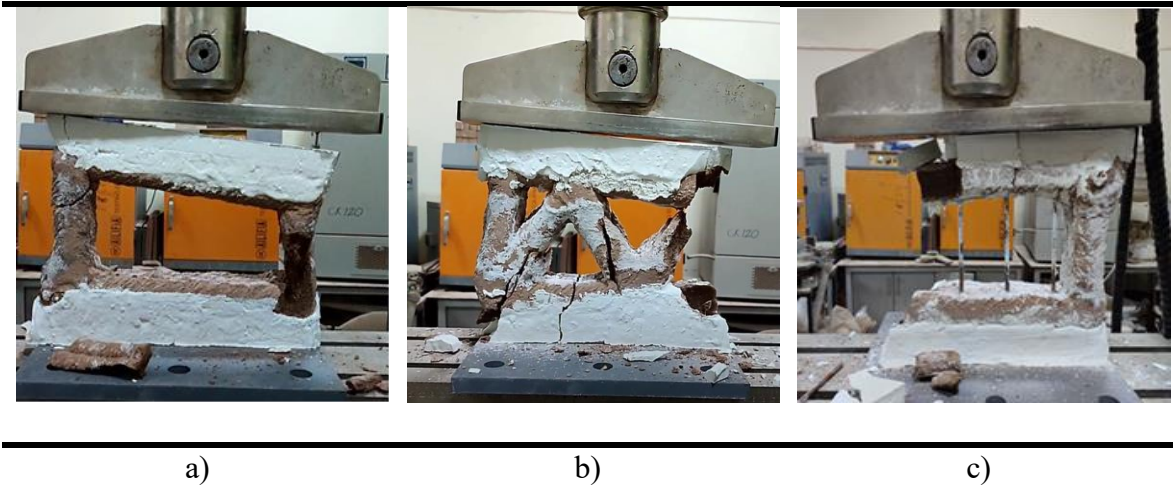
Typical failure patterns under compressive loading a) OOP-B specimen, b) OOP-Z specimen, and c) OOP-RS specimen.
